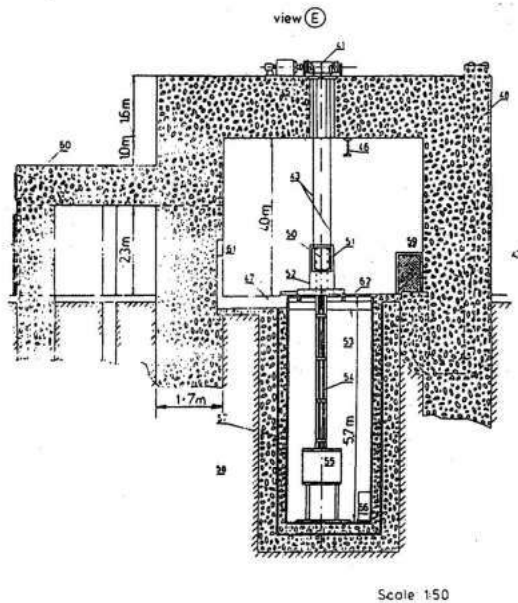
Elevation View of GIF-1 Assembly Showing its Concrete Shield
